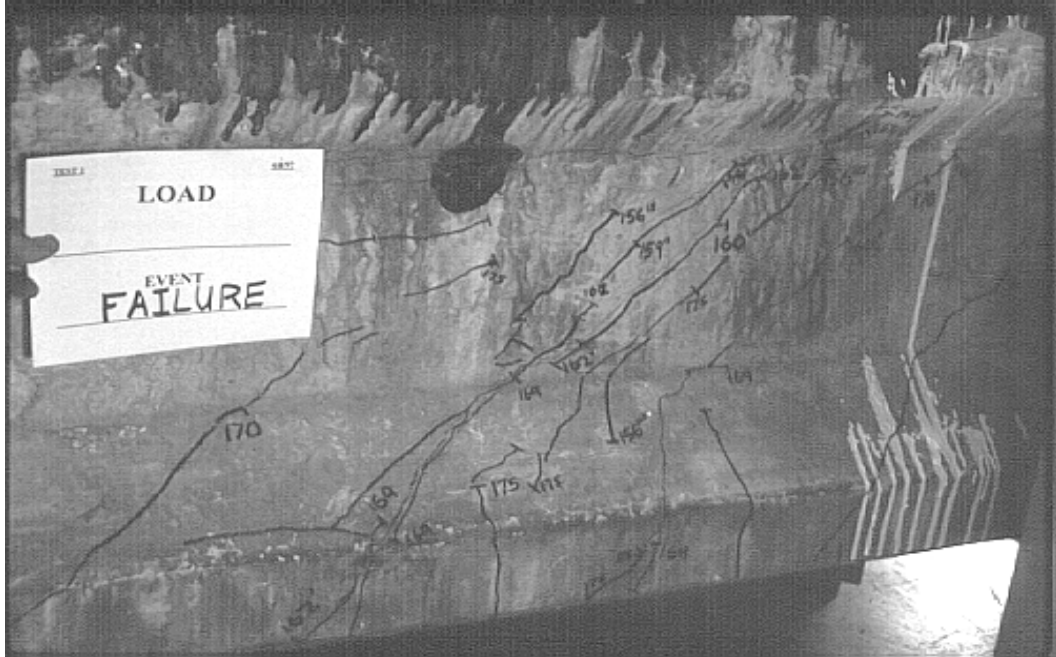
Cracking and Spalling at Failure on East Face of Box Beam 3
